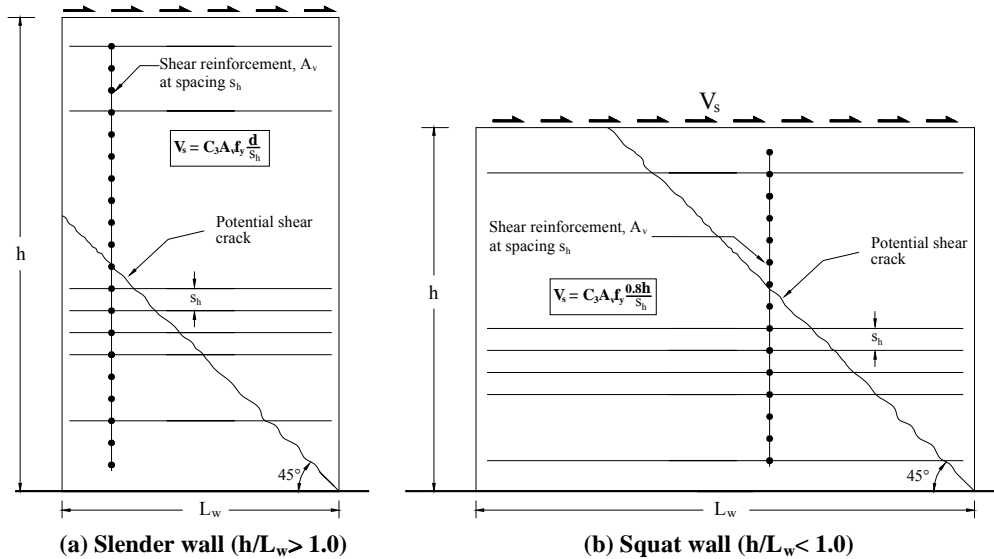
Shear reinforcement for cantilever walls (Priestley, 1980).
